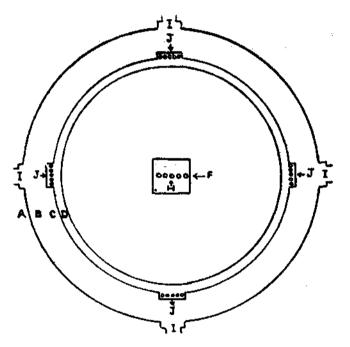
(b). - PLAN OF THE AMARAVATI STUPA Scale about 1"=54'
